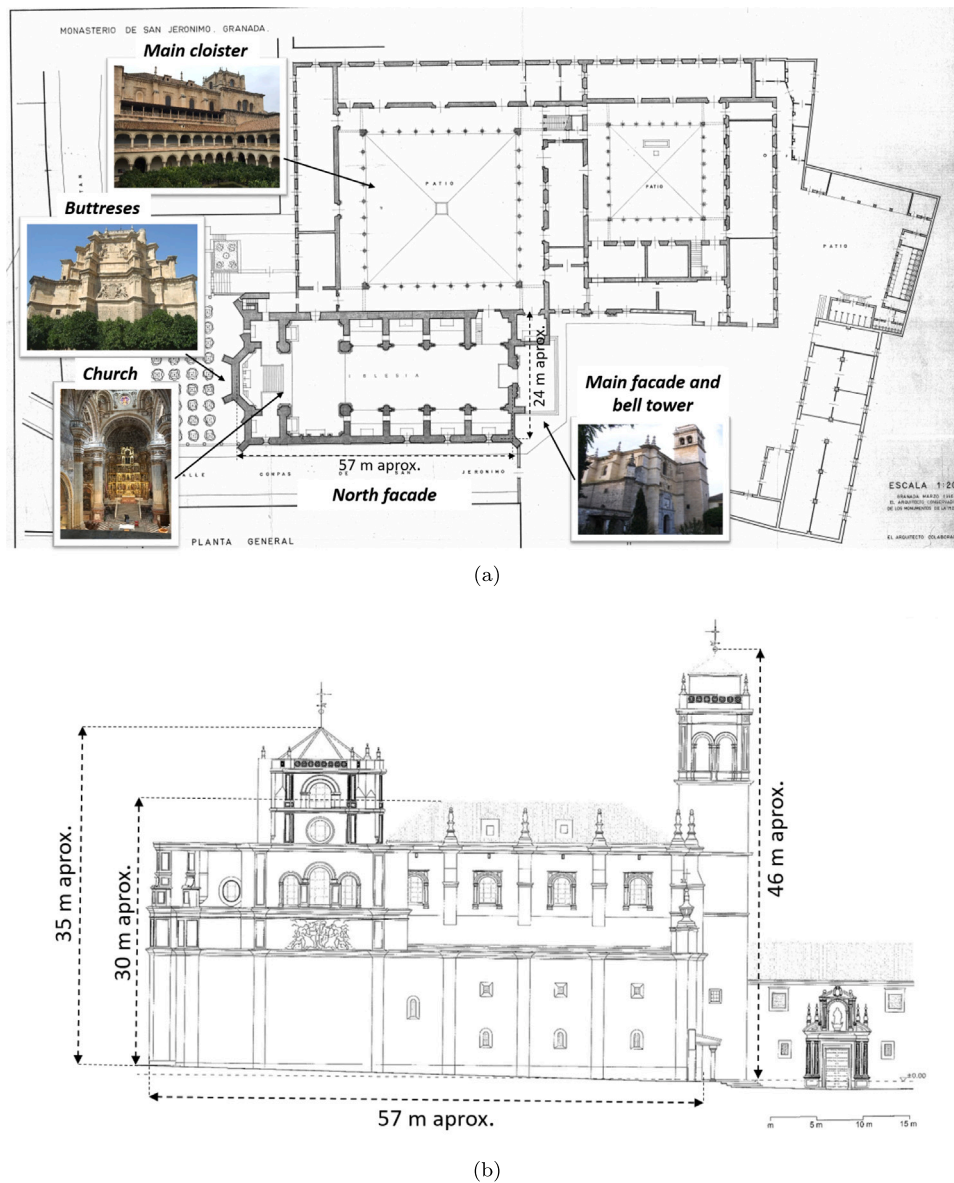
Views of San Jerónimo Monastery. (a) Plan view, (b) Elevation view of the north facade.
